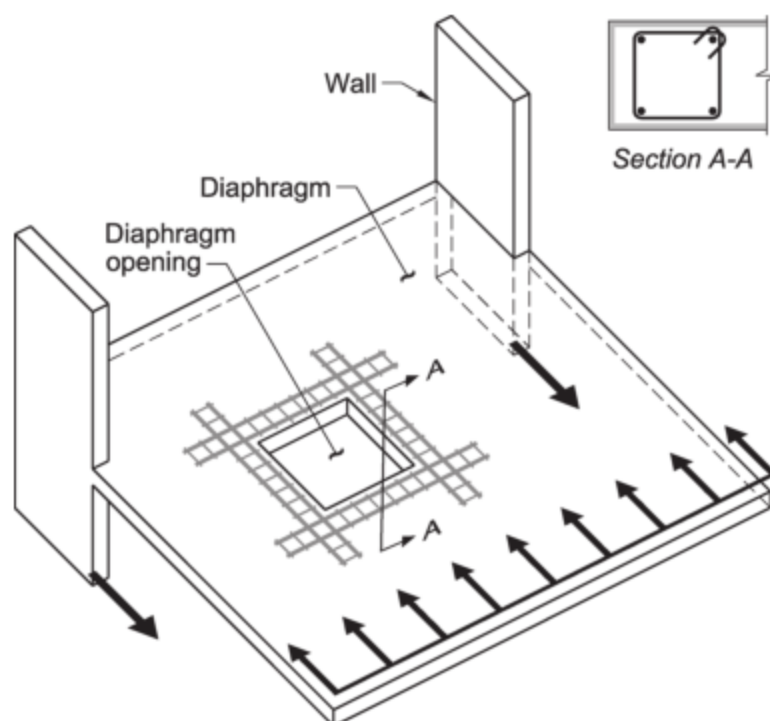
Reinforcement detail around opening within diaphragm.
